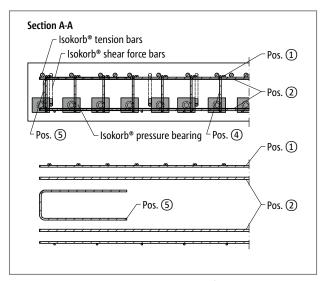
Schöck Isokorb® T type K-M12: On-site reinforcment on the balcony side in the Section A-A; Pos.5 = structural edging at the free edge perpendicular to the Schöck Isokorb®
